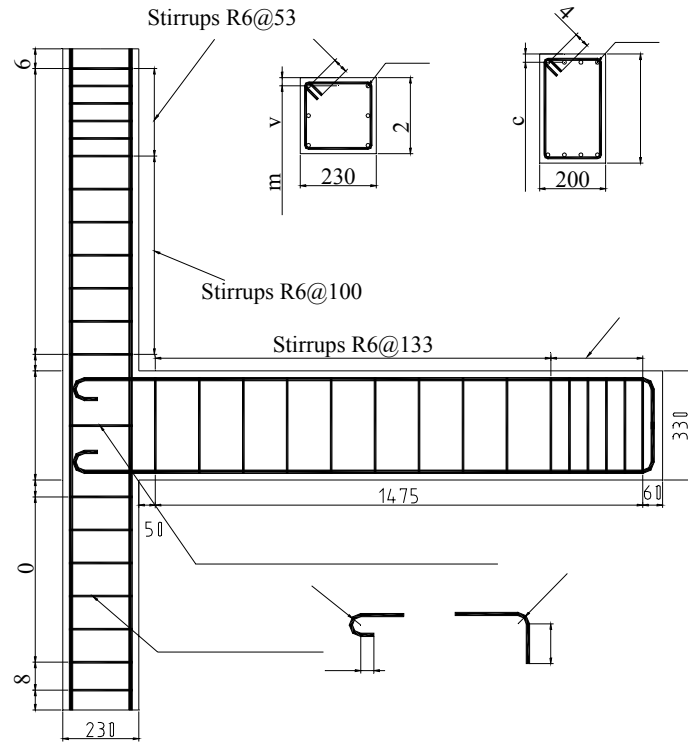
Dimensions and reinforcement details of the as-built specimen TDP2
